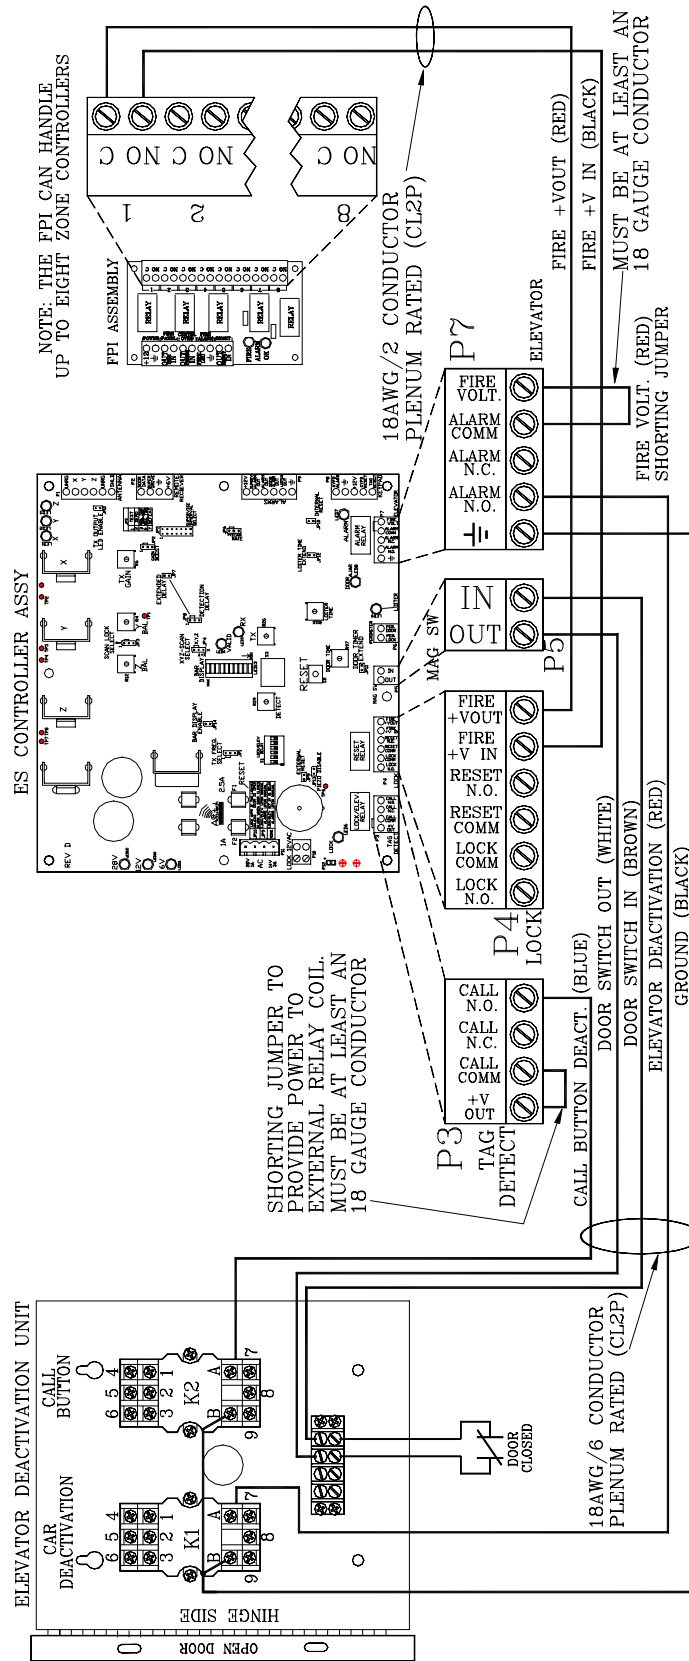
Connecting the Elevator Deactivation unit to the Controller
